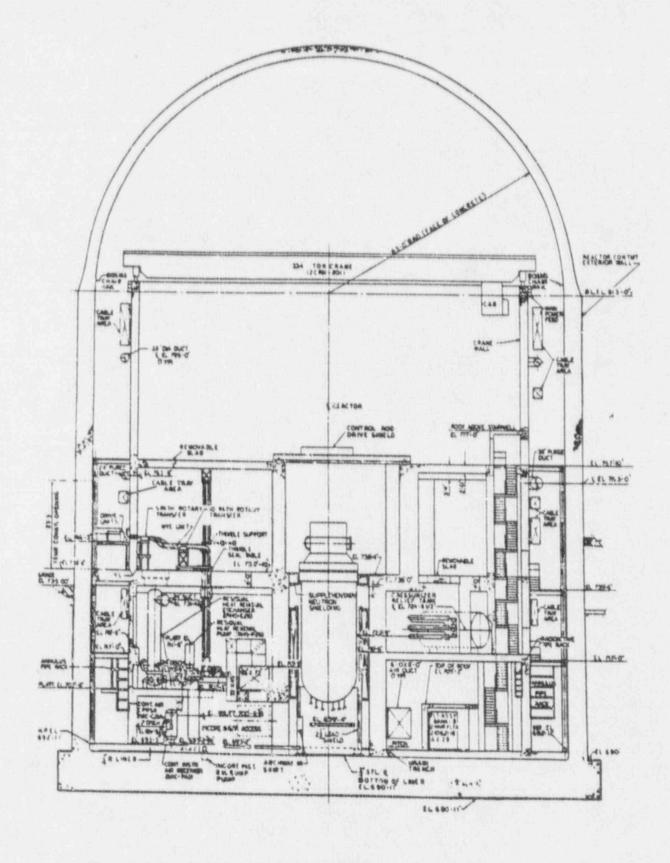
Section Views of Seaver Valley 2 Containment (Sheet 1 of 2)
